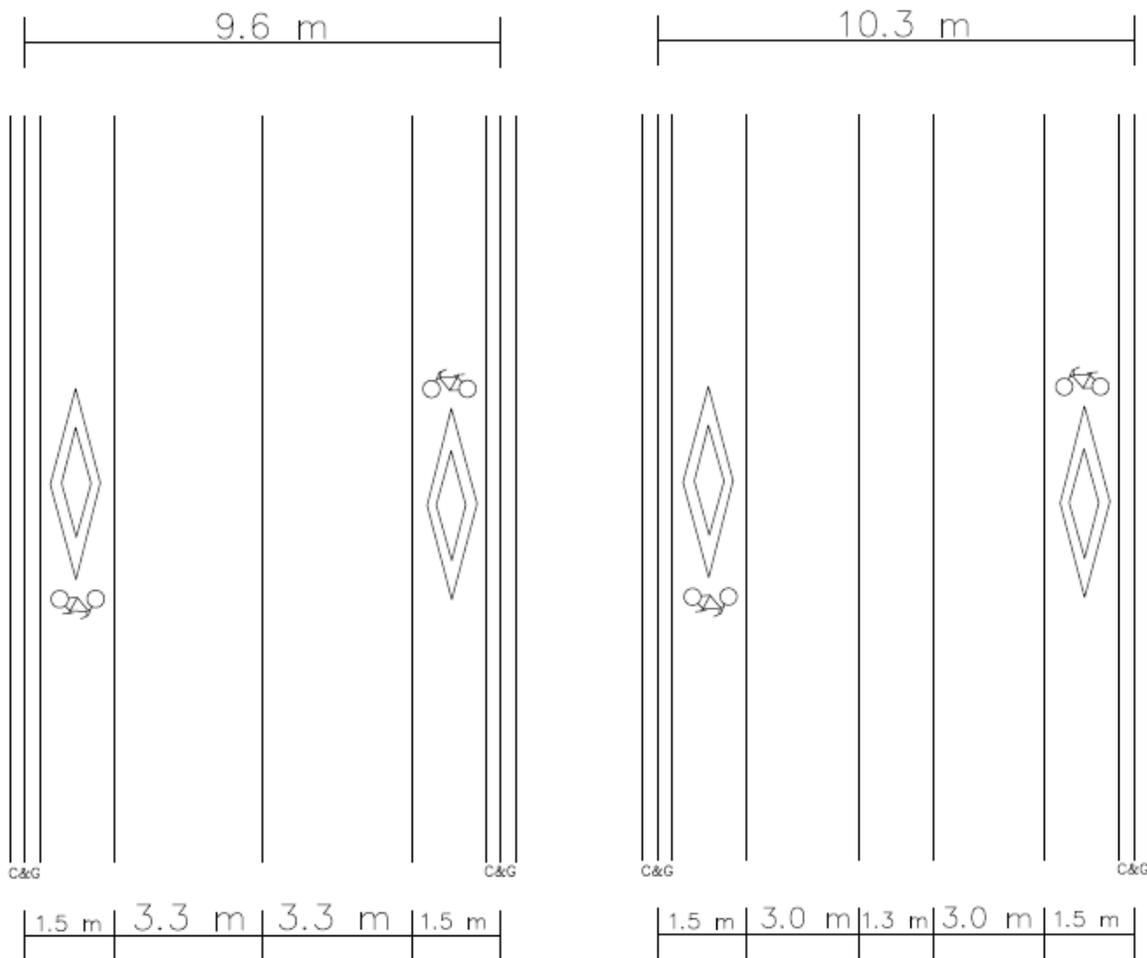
and 4 show a re-marking of the existing pavement for the narrow section west of Guelph Line and the similar treatment on a typical section east of Guelph Line.
